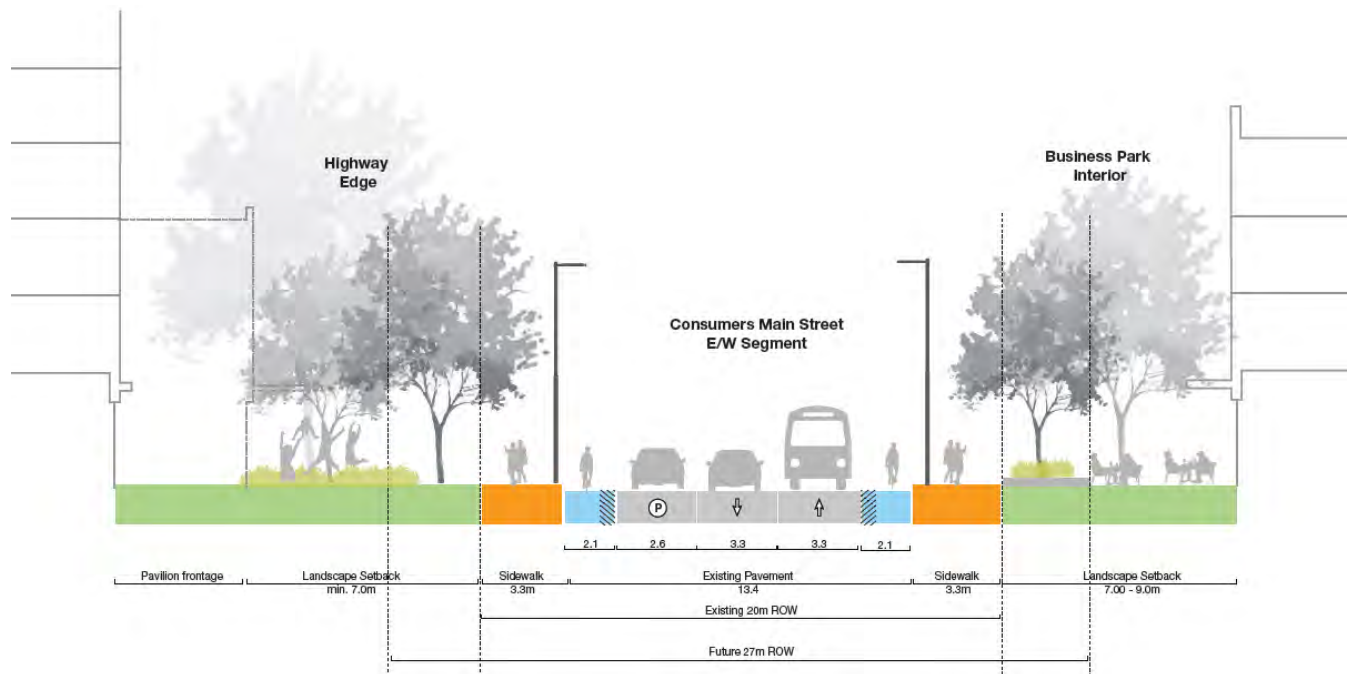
Consumers Road Preferred Cross-Section, East-West Segment
